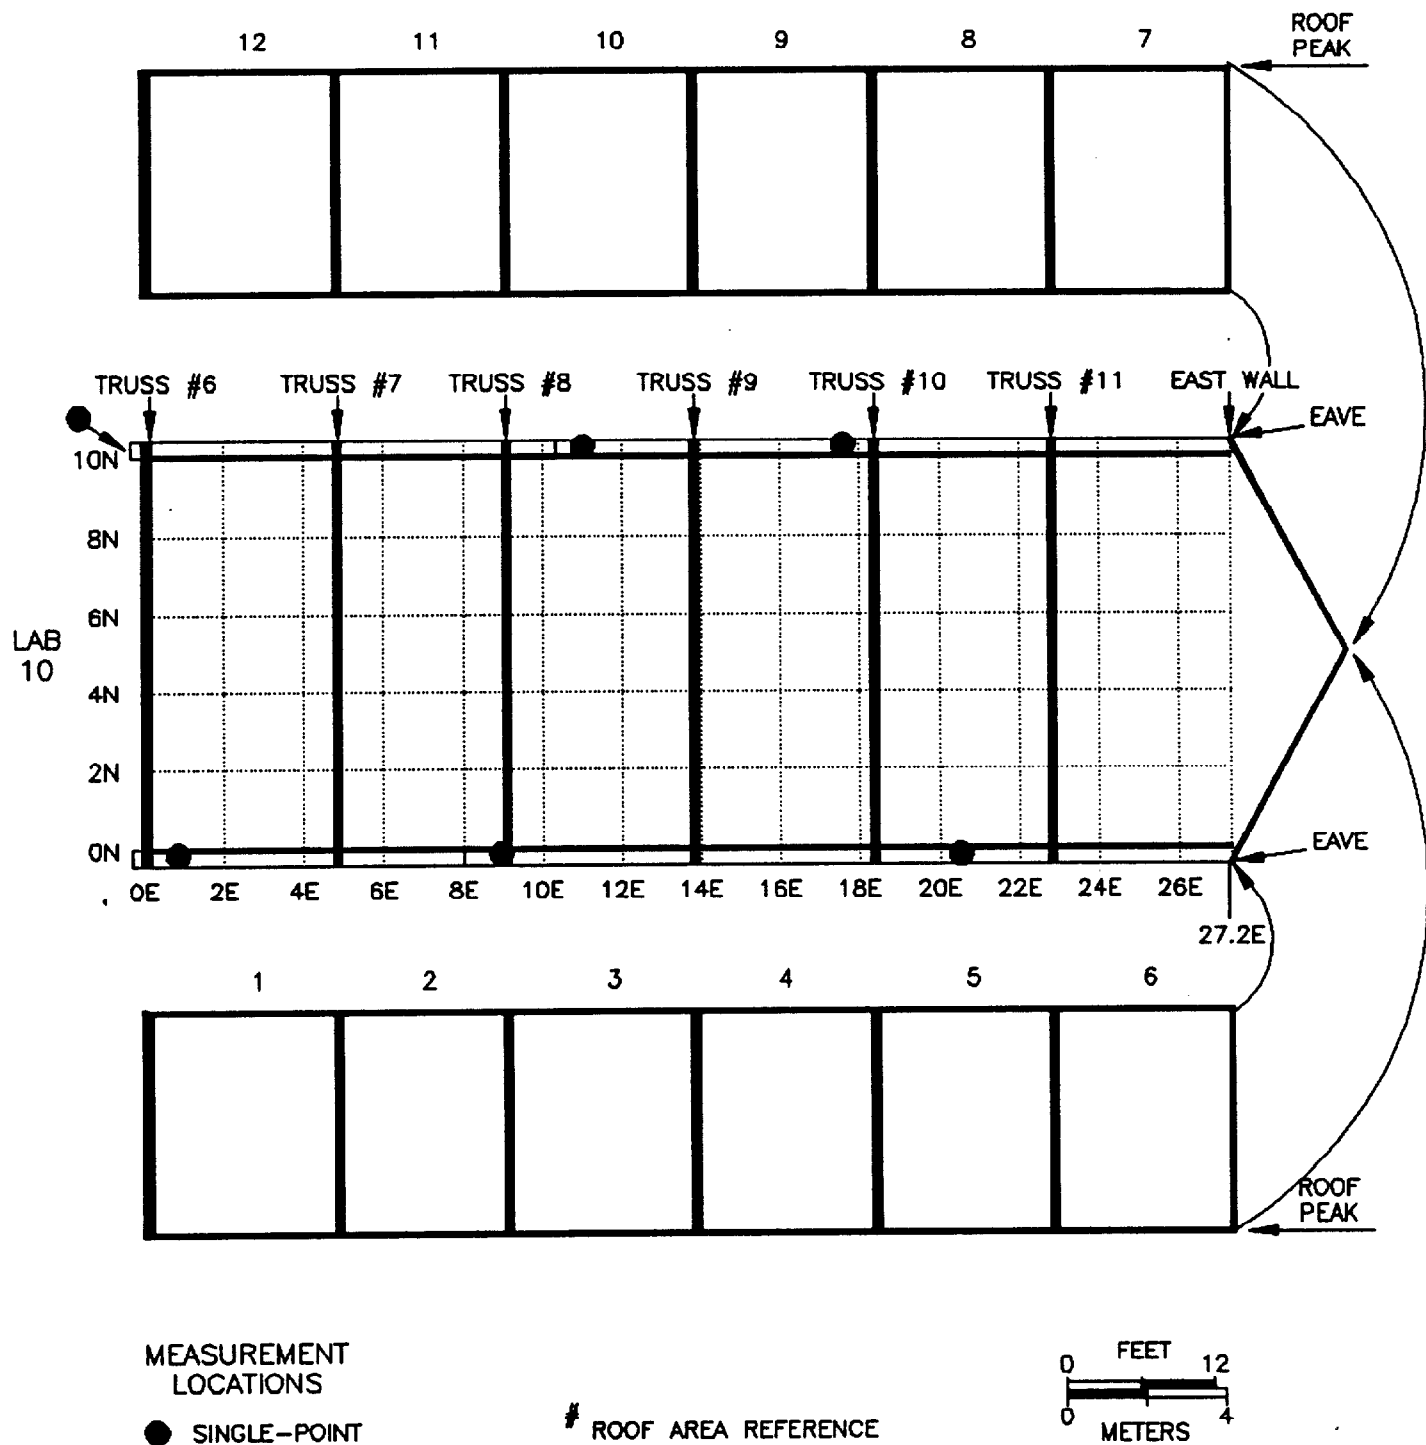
Building 17, Attic Eaves, Roof and Trusses – Measurement Locations on Roof Eaves
